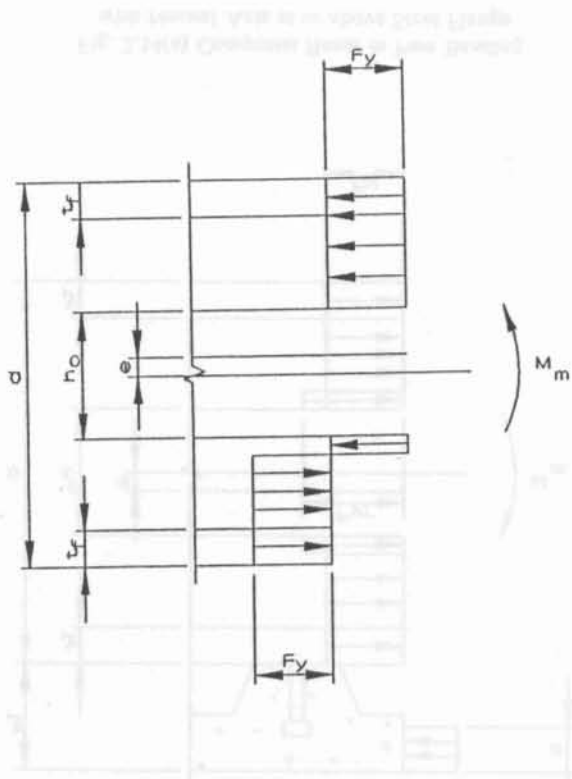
(a) Unreinforced Steel Beam in Pure Bending
